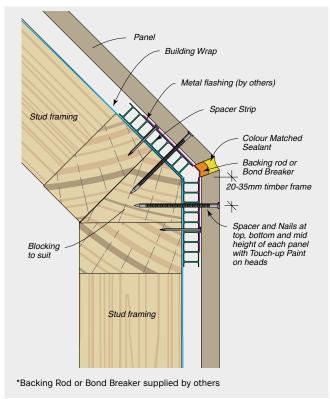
Obtuse Angle Corner Detail – With Metal Flashing and Colour Matched Sealant – Plan View
